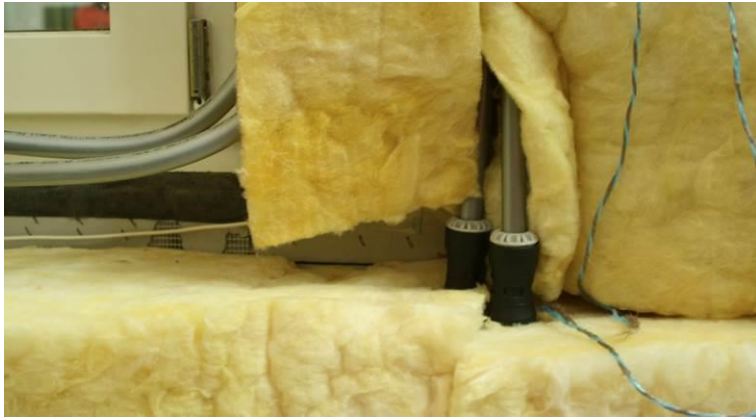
Connected heat distribution system pipes. Note the gaps and bent thermal insulation. In real case, this side would be facing the existing wall, so there will be no easy way to unbent it easily (there is access from the window, but the gap is 12 cm wide, so it would be challenging and at least time consuming to make the smoothing). So perhaps there will be need to be some cuts in the thermal insulation or used specially shaped pieces of harder thermal insulation. Another (recommended option) is to simplify the whole system and design the thermal insulation thickness in a way that water-based heat distribution system can be abandoned and heating provided just by the warm air.
